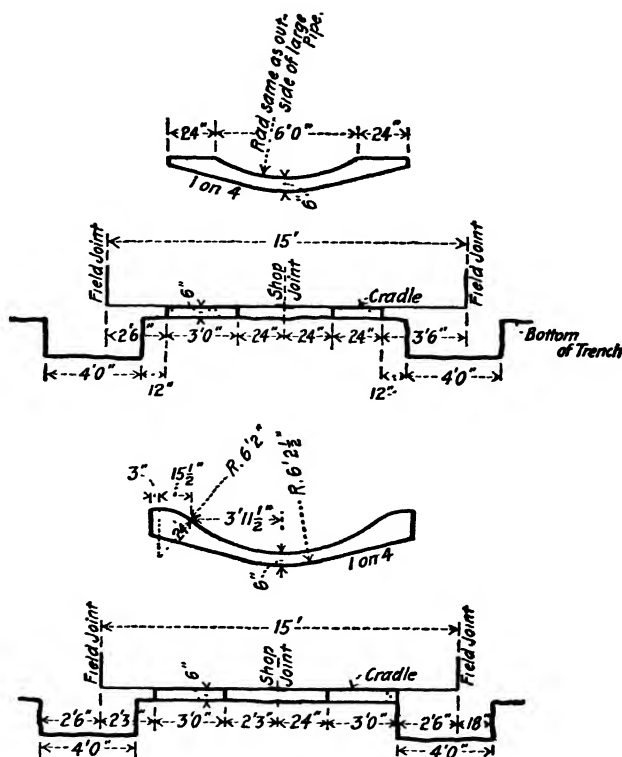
9 to 11-ft. steel pipe siphons, concrete cradles, Catskill aqueduct.
